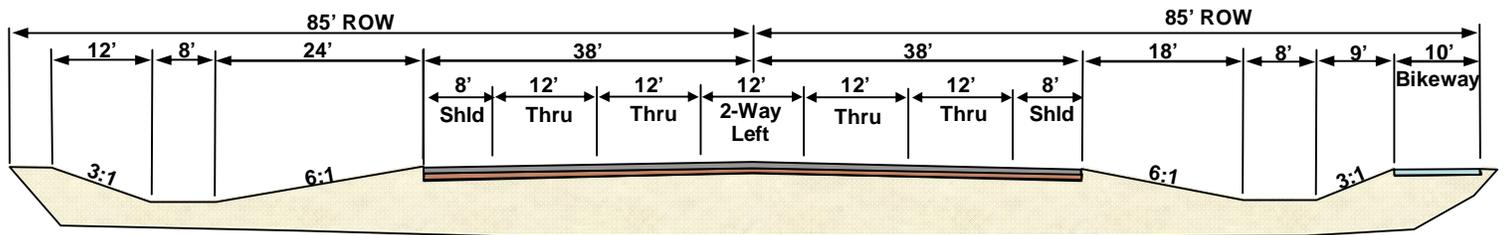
71st Avenue Typical Cross Section (from Northern Bridge Crossing Study)
